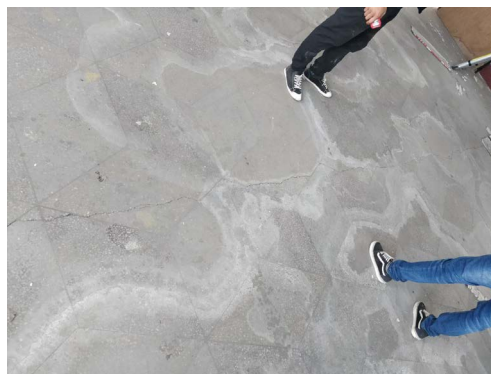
Cracked butt joint of prefabricated slab in 8th floor 4-7/C-G axis
